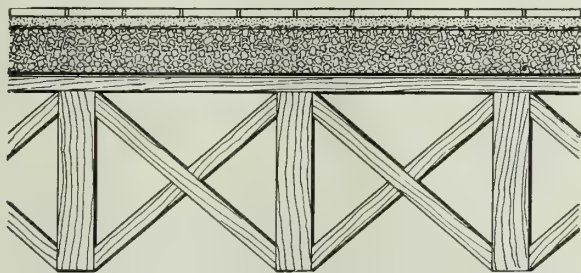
CONSTRUCTION FOR TILE IN NEW BUILDINGS
